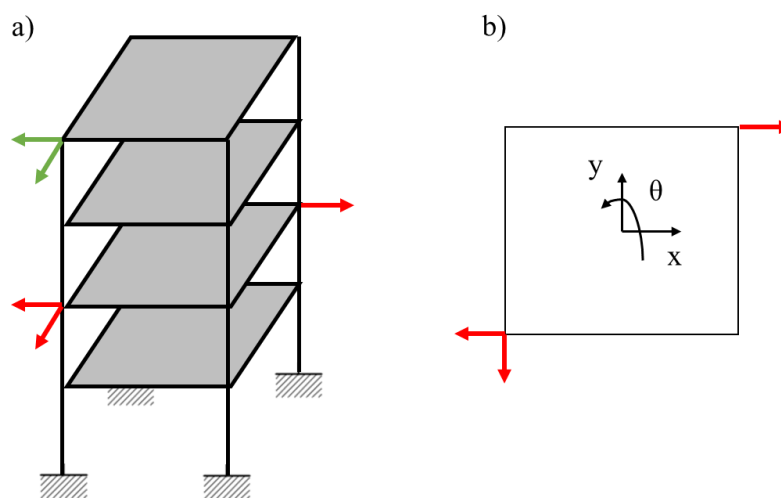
Schematic overview of a “box type” 3D building structure with a generic sensor layout.
